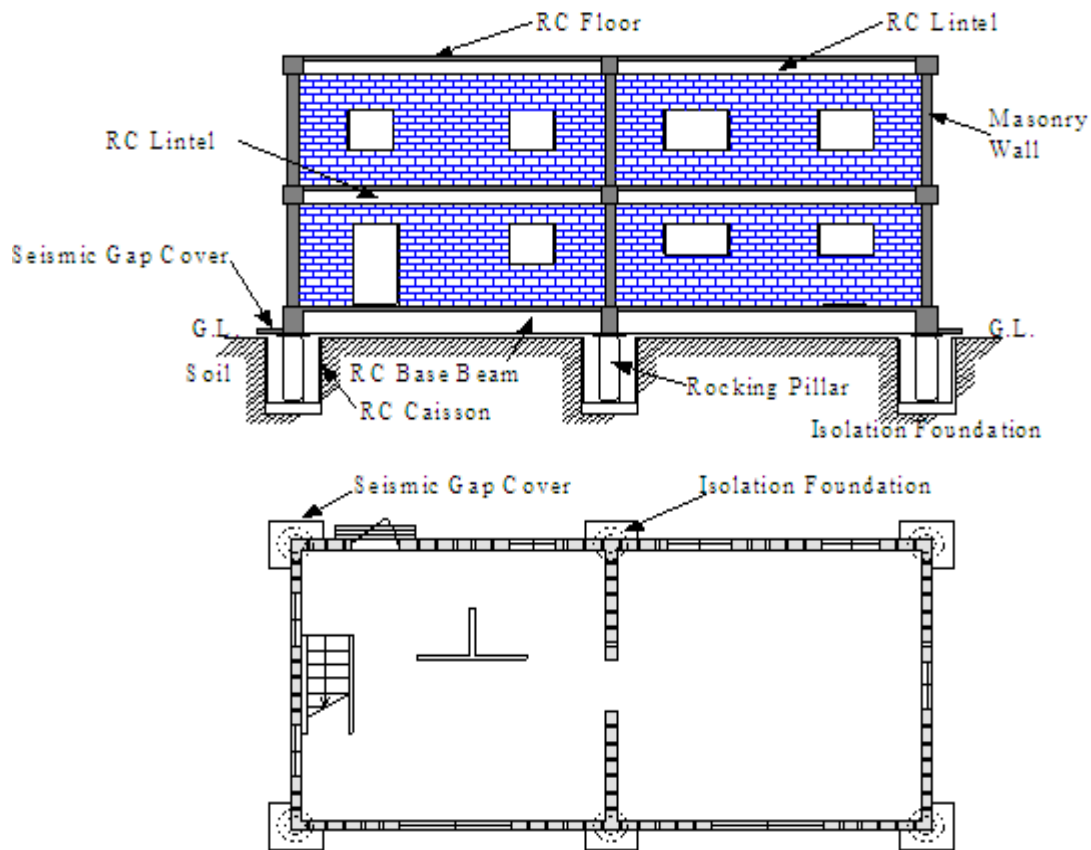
Plan and Section of Masonry House with Isolation Foundation
